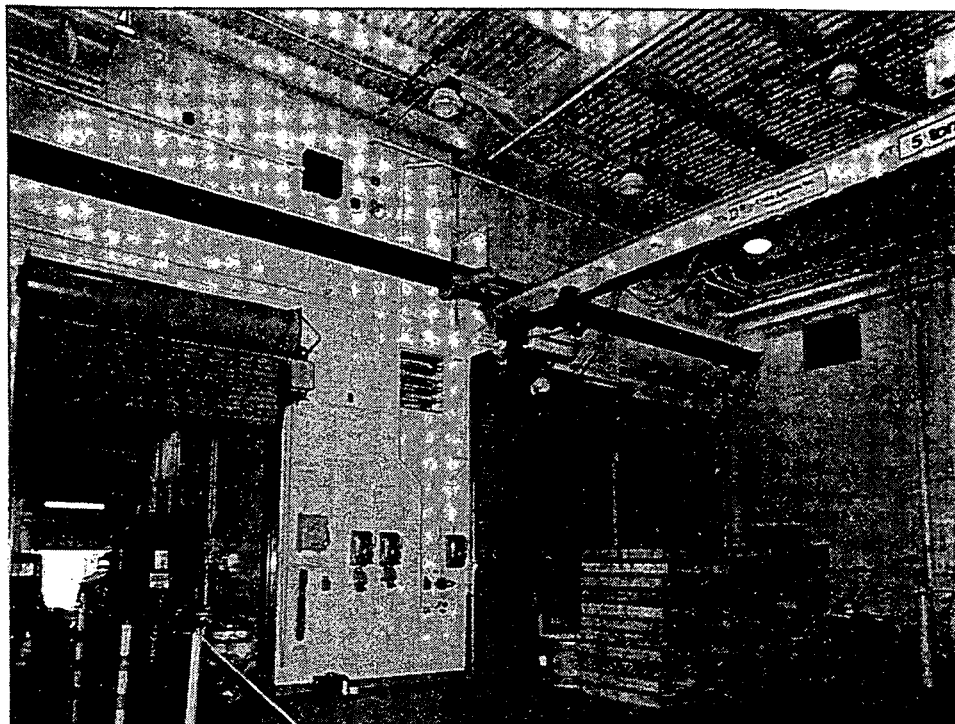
Building 78 - First Floor, 5-Ton Crane and Roll-up Door
